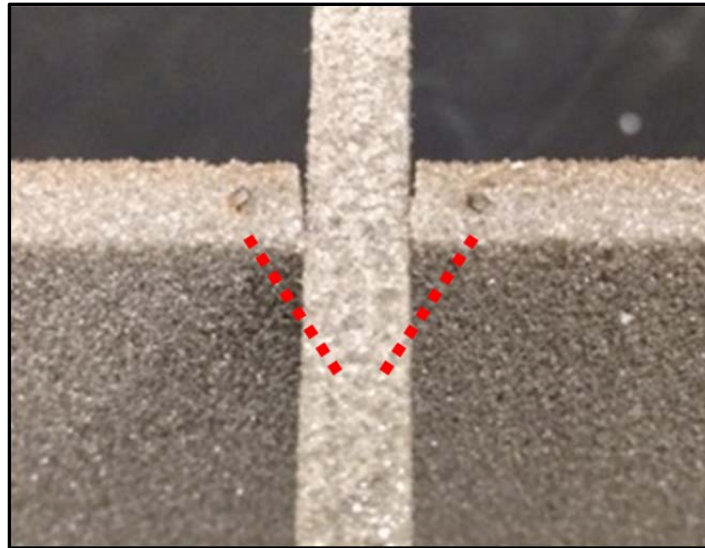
Brad Nail Locations a Baffle Wall Connection.
